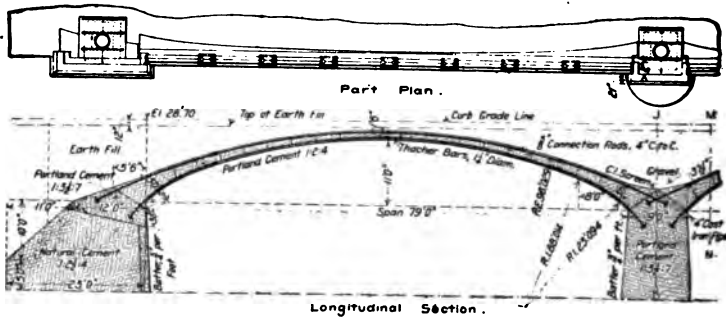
Details of 79-Ft. Span, Grand River Bridge, Grand Rapids, Mich. section of the bridge showing the reinforcement and centering used, is shown in Fig. 600.
